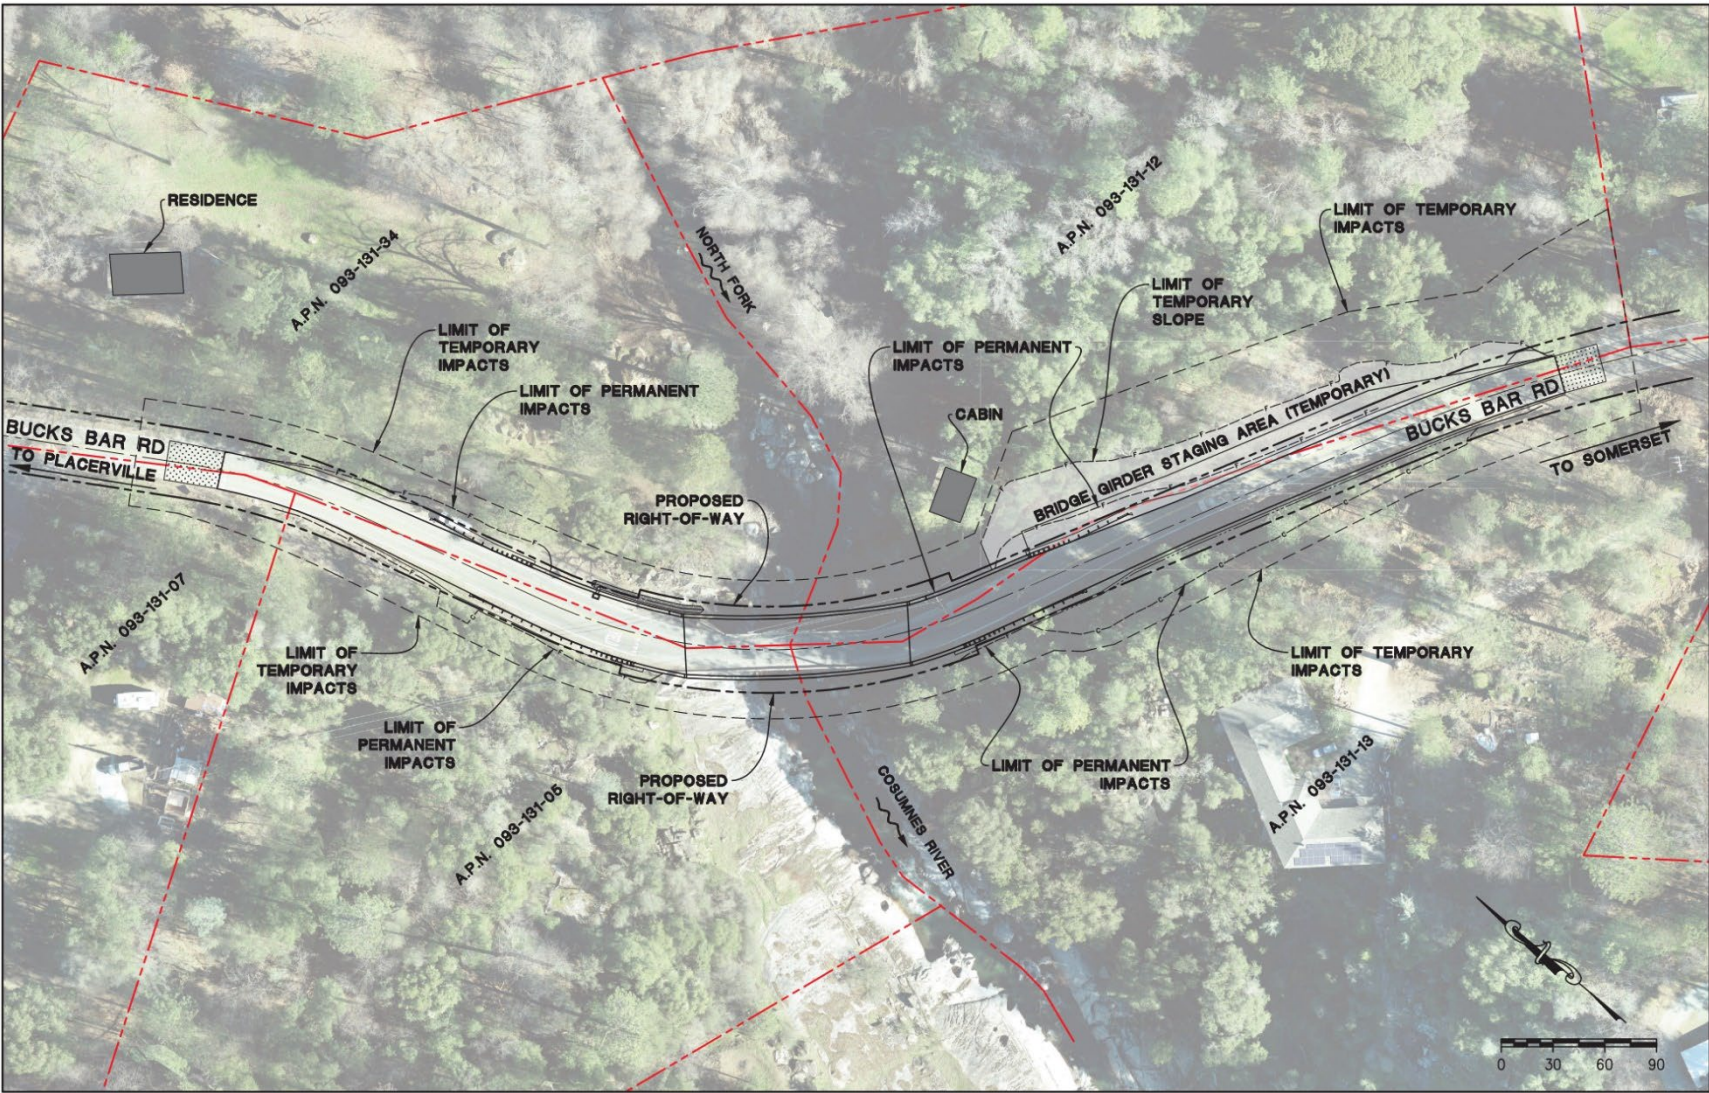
Plan View of Proposed Project on Bucks Bar Road
